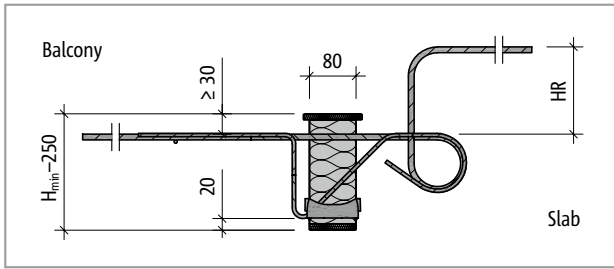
Schöck Isokorb® T type K-HV: Product section
